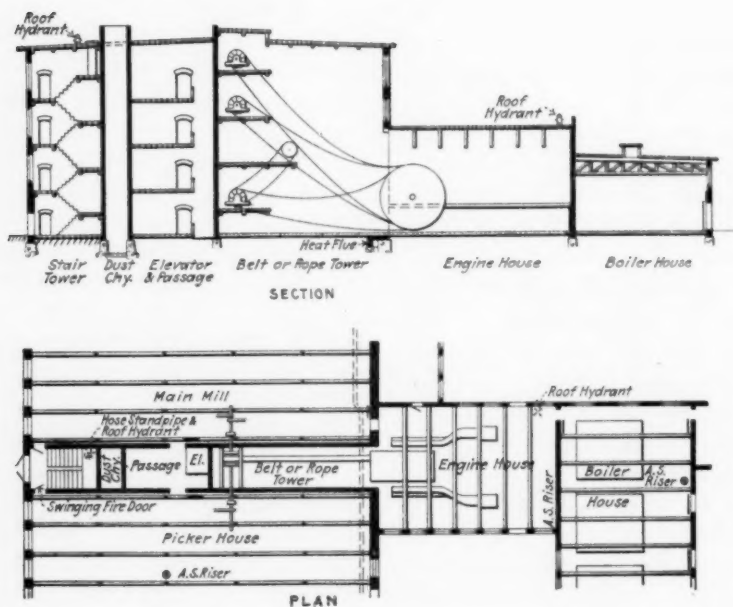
BELT, STAIRWAY AND ELEVATOR TOWERS
